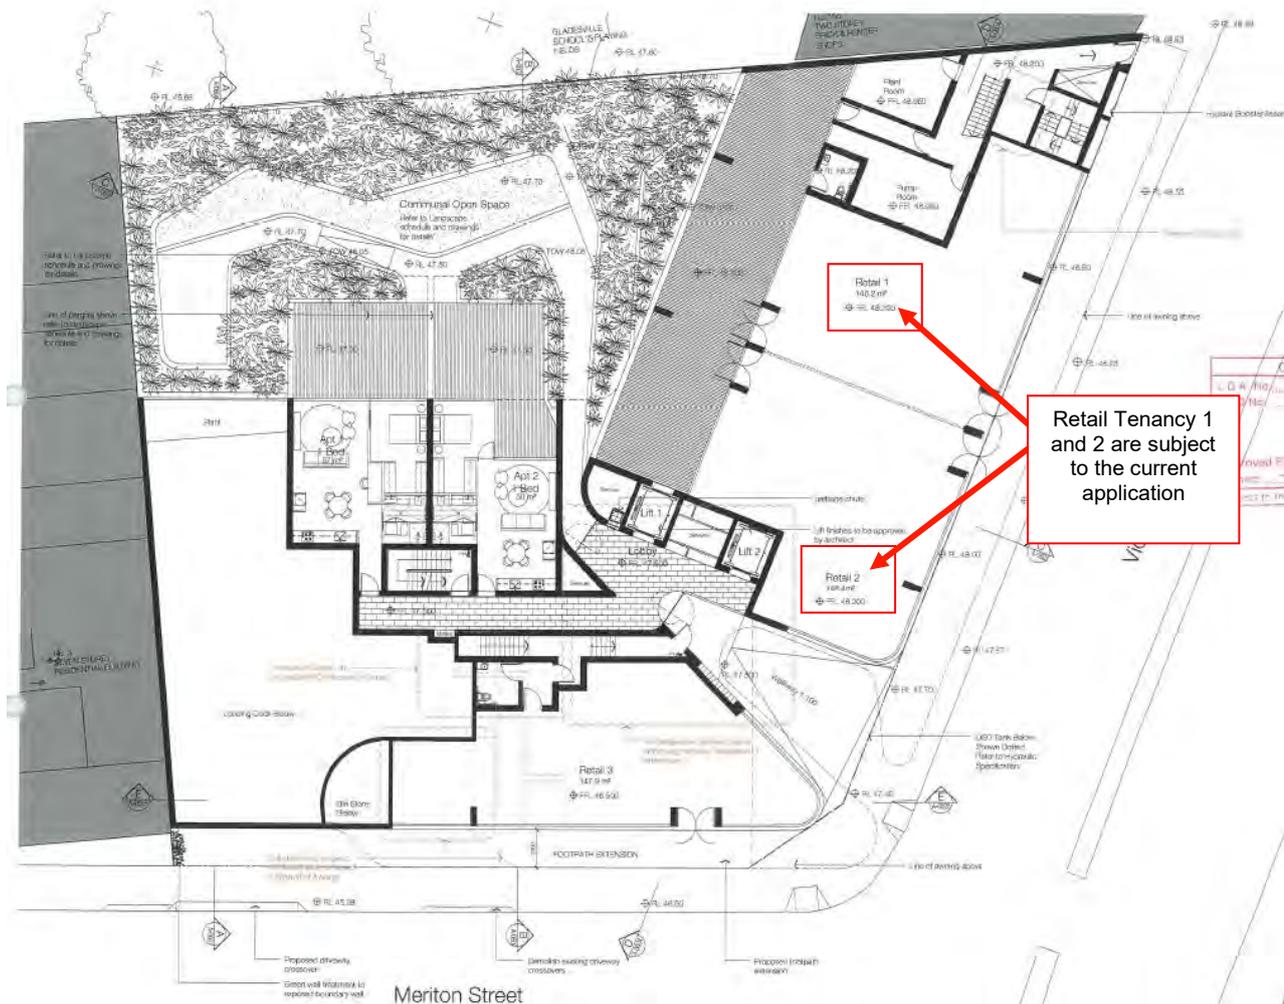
Extract of approved ground floor plan under MOD2016/0047 with subject tenancy identified in red
